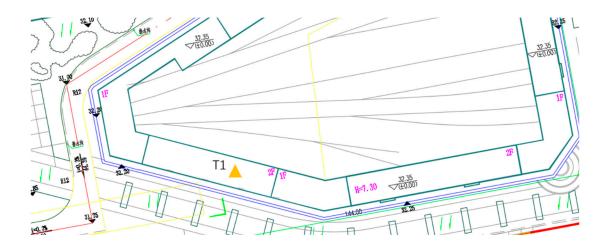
Measurement points layout plan for the 2nd floor of the shop in the throat area.
